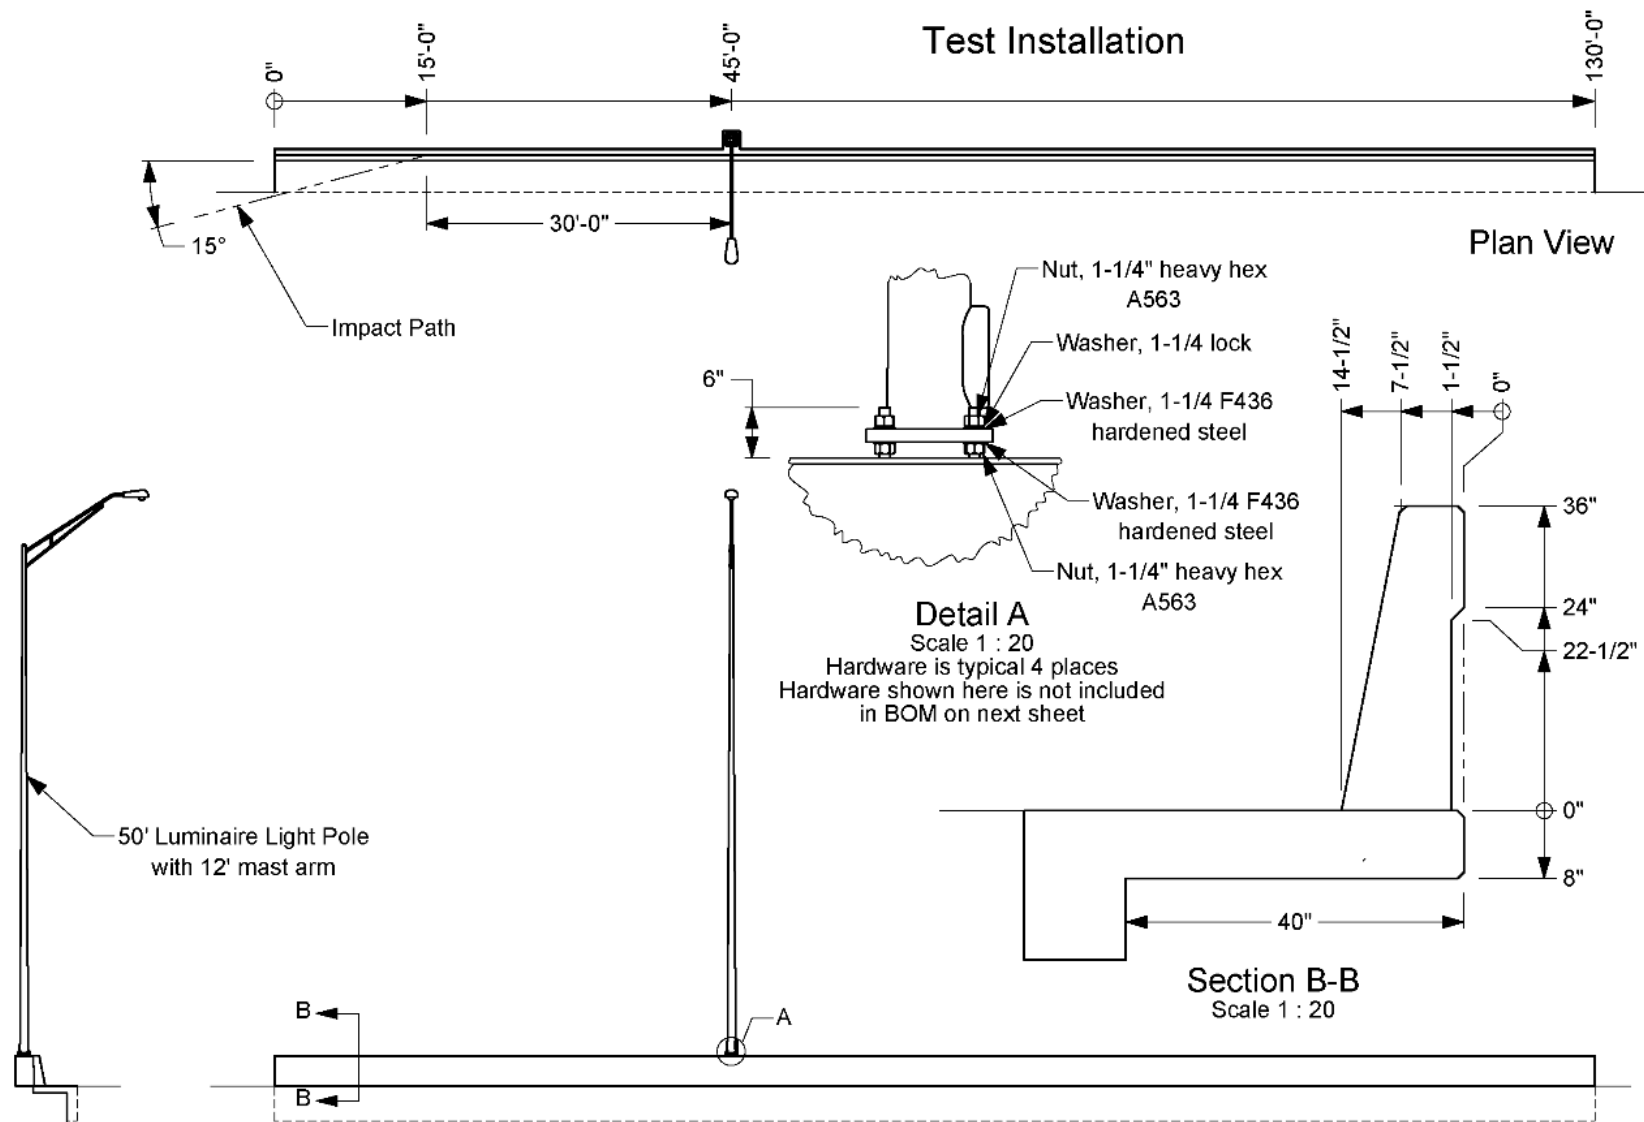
Details of Luminaire Pole behind Single Slope Traffic Rail.
